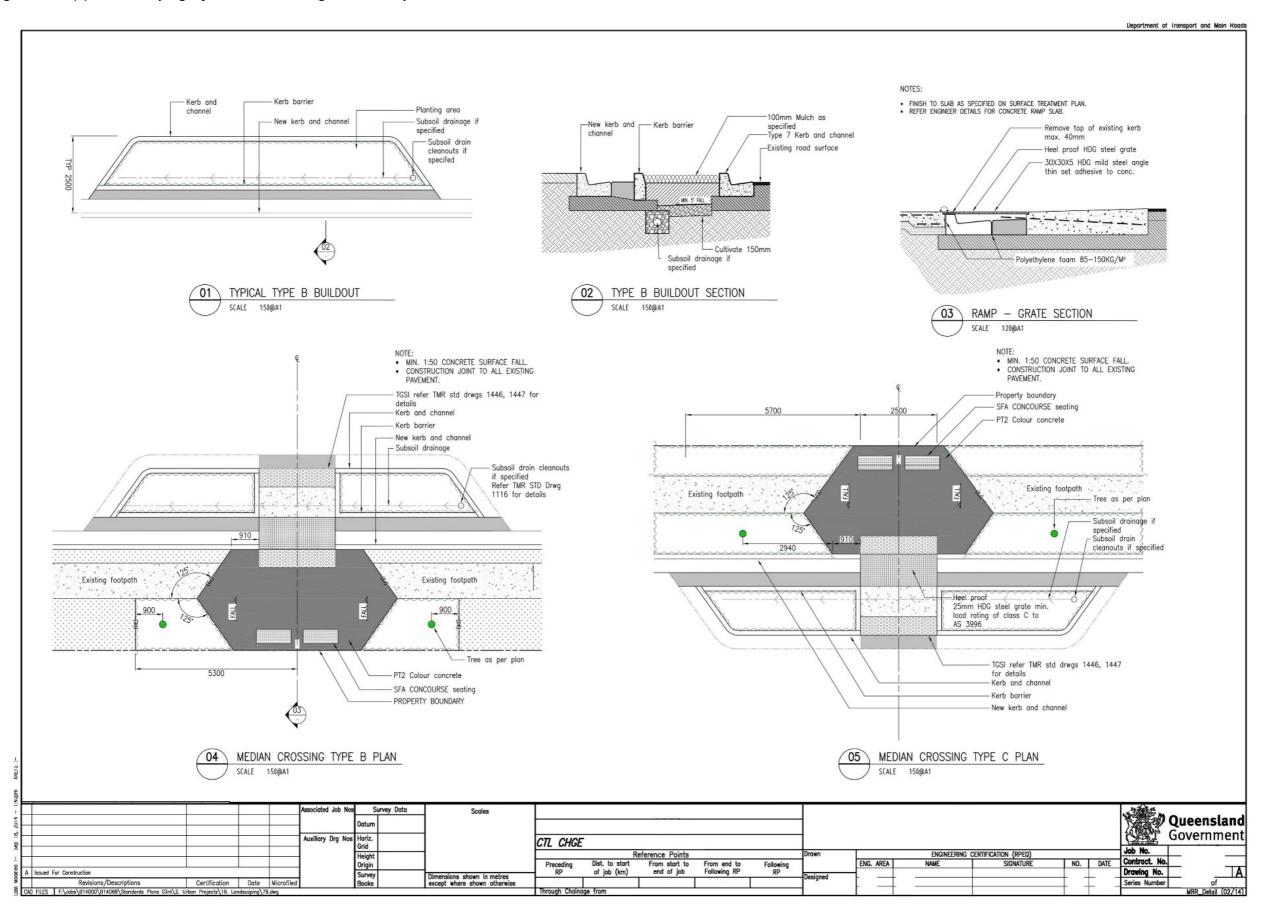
(h) – Landscaping layout and details – generic example 8
